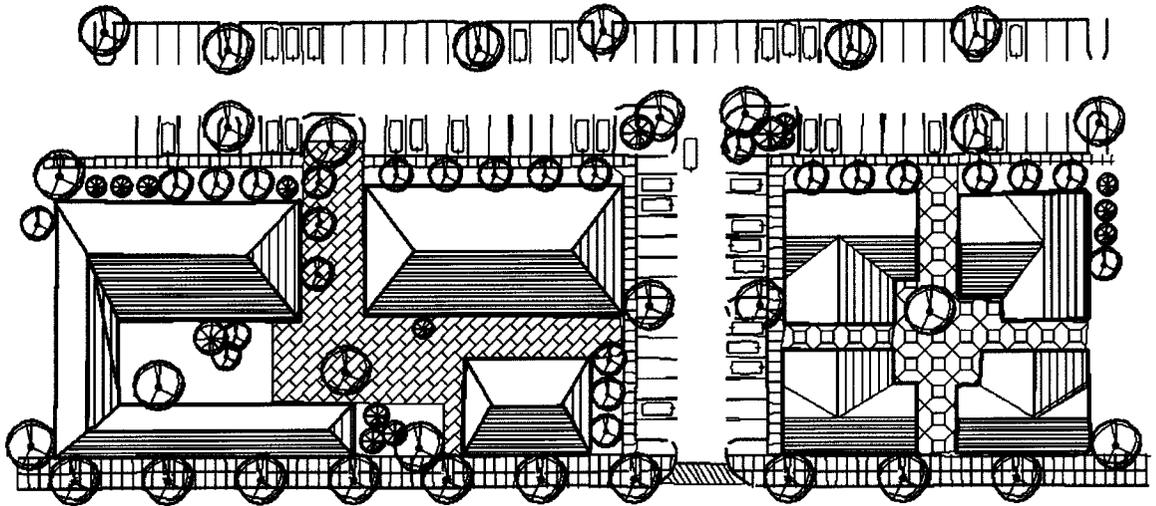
Locate parking at the side or behind the building. Parking between the main building and the primary street is not allowed.
